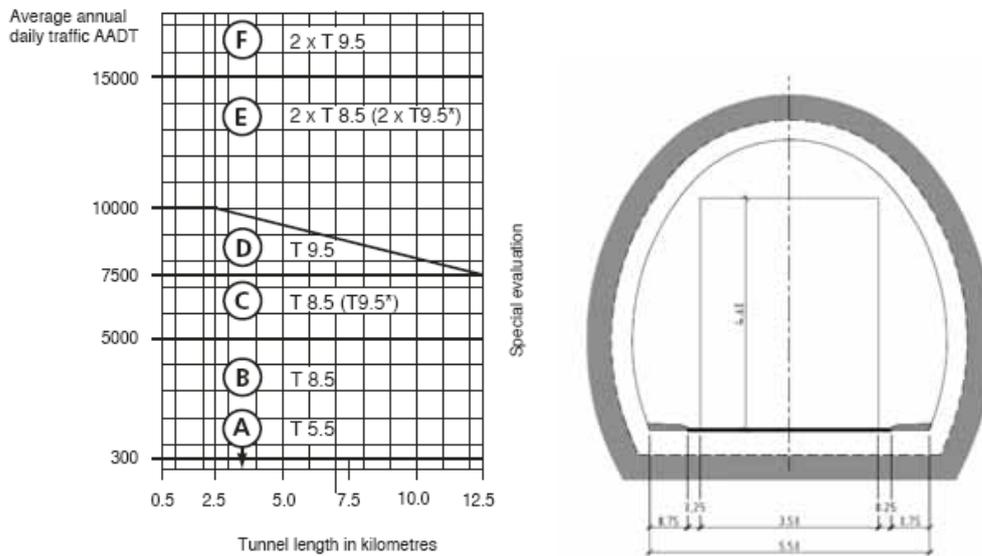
Road tunnel categories and tunnel cross-section T5.5 of Norway [13]
